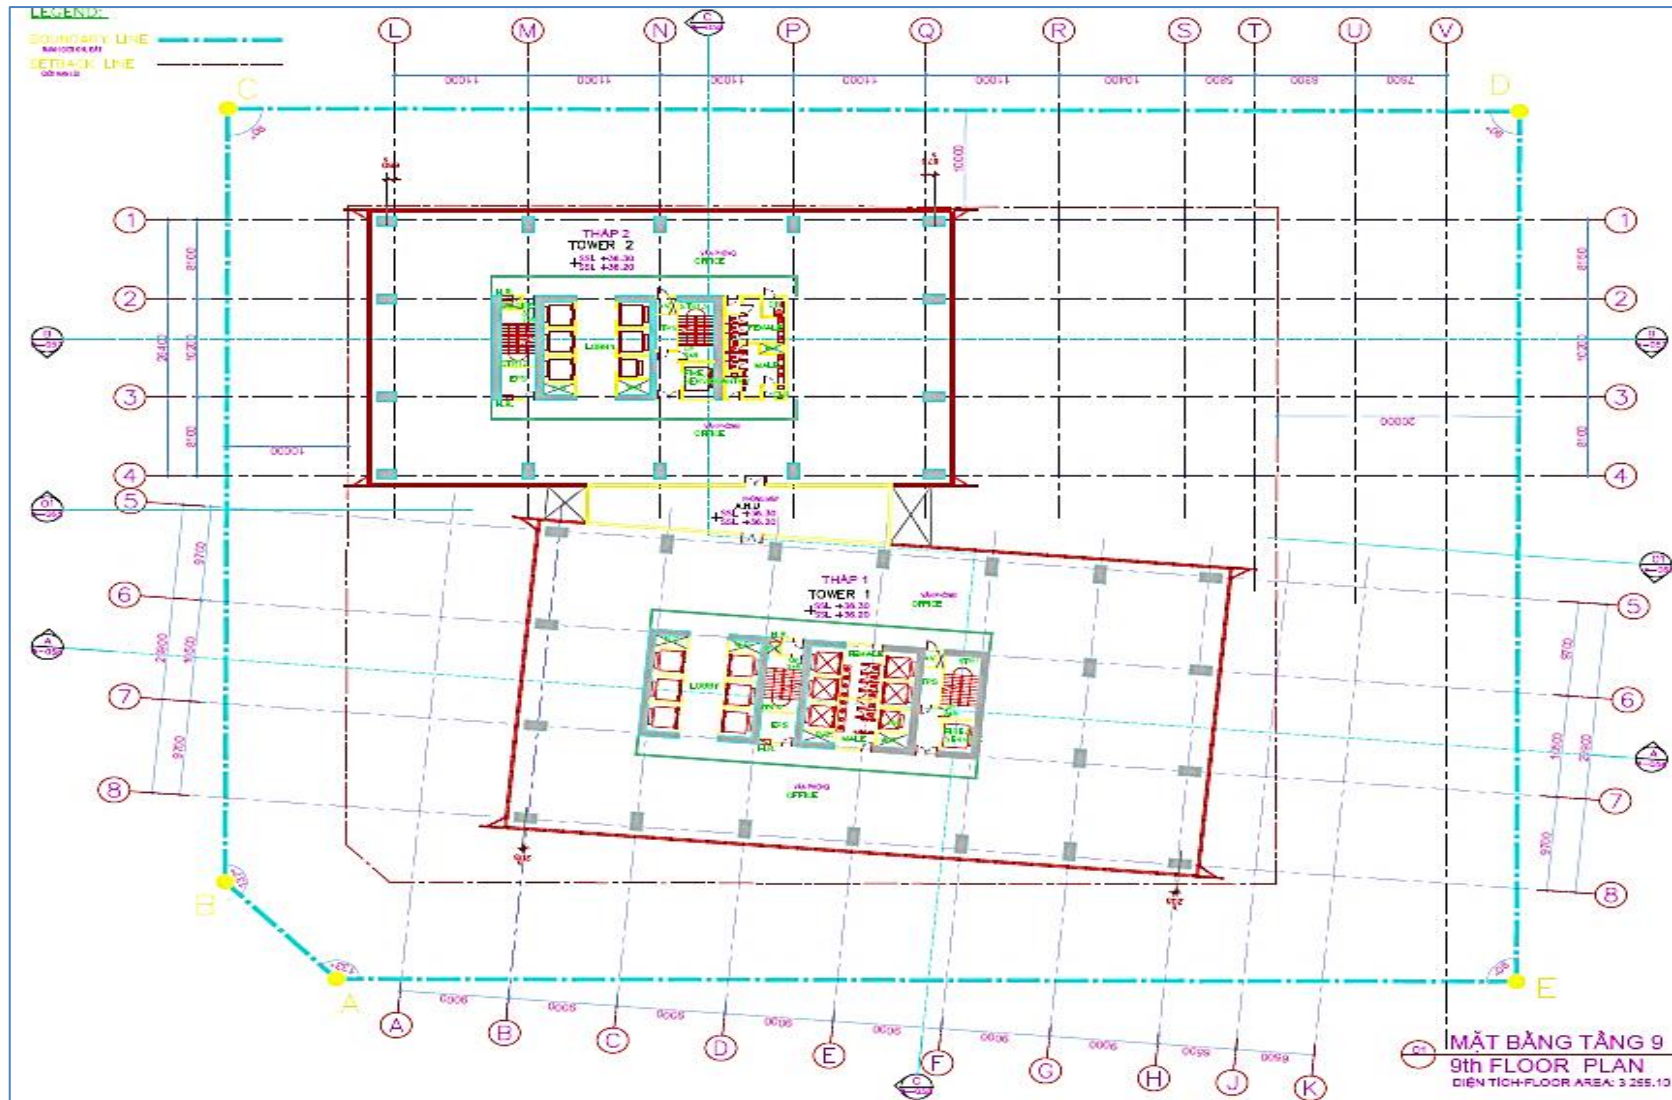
Typical floor plan from 9<sup>th</sup> up to end story, excluded story 24,28, 32, 36, connected floor slabs
